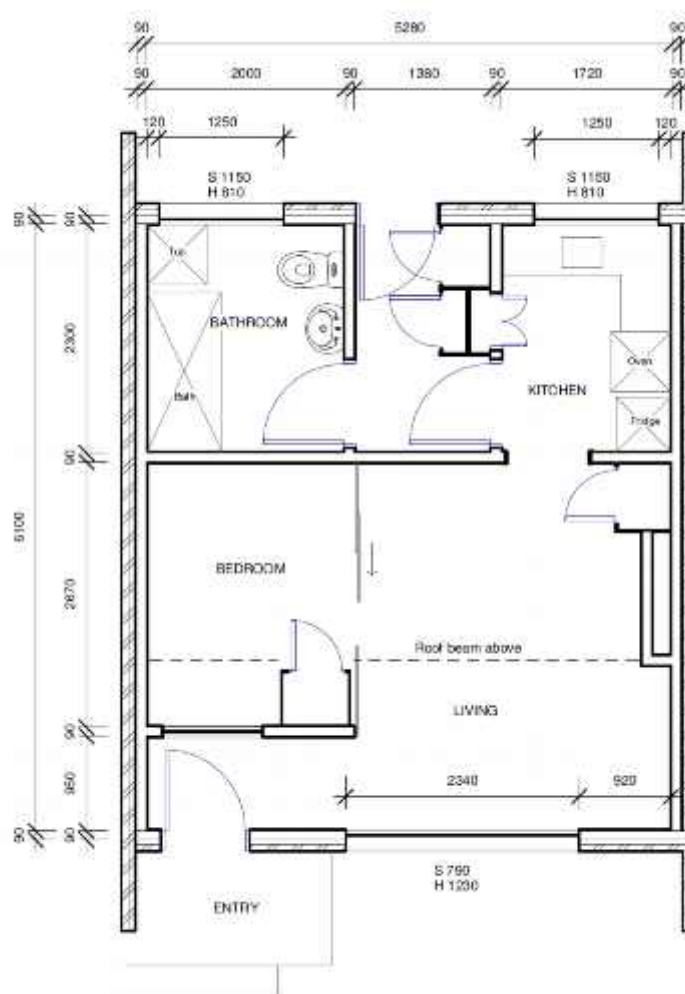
Partial floor plan of residential unit blocks (note that the bedsit units have a slightly different layout but are considered structurally identical).
